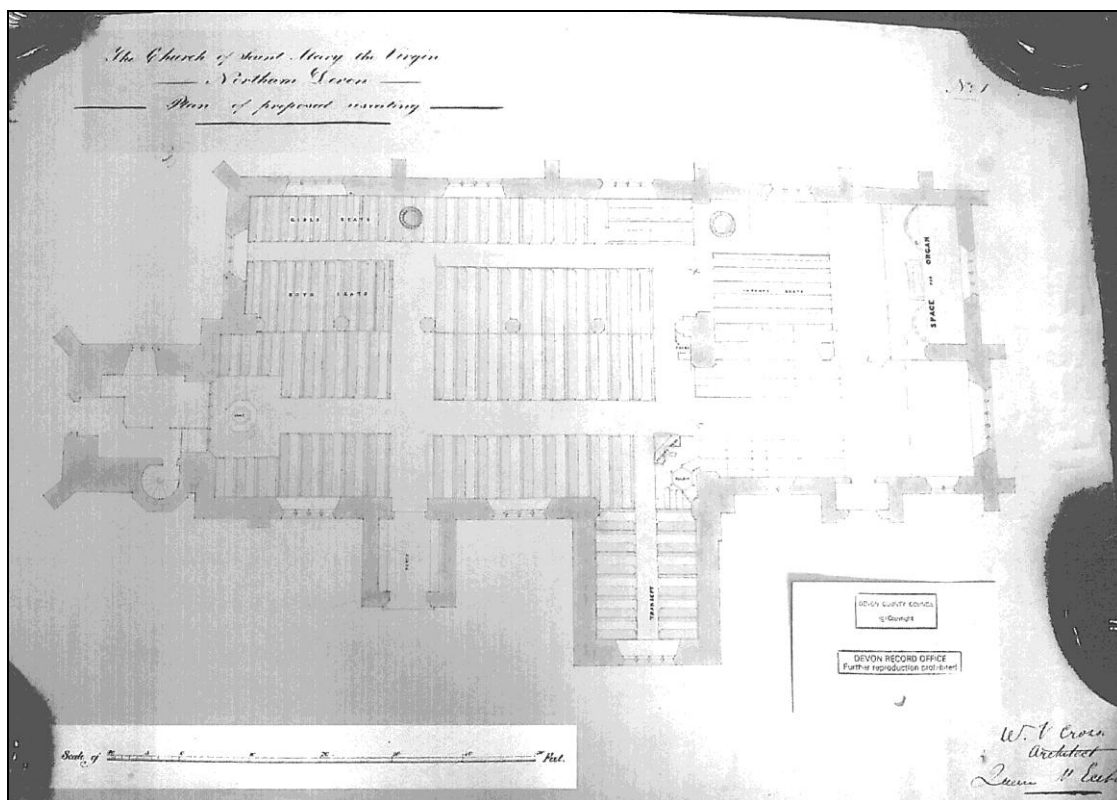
The proposed mid 19<sup>th</sup> century floor plan (DRO).
